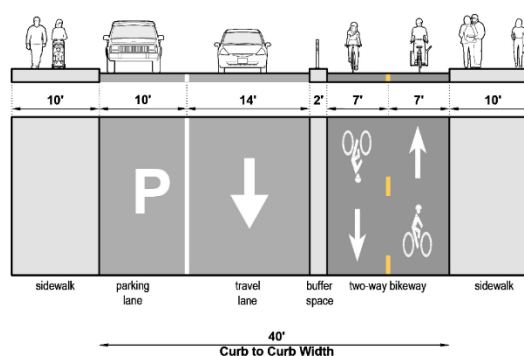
Proposed conditions on 10th Street between Cedar Street and Jackson Street.
